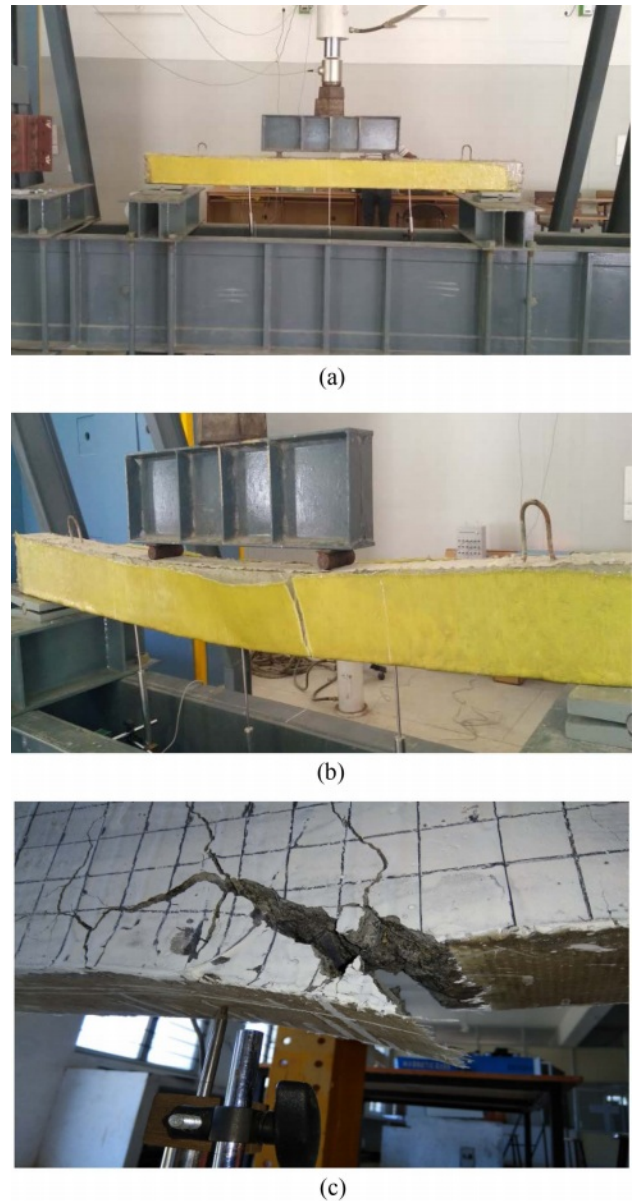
(a) Testing of U shaped (RU) retrofitted RC beam. (b) Failure of U shaped (RU) retrofitted RC beam. (c) Failure of RC beam retrofitted bottom.
